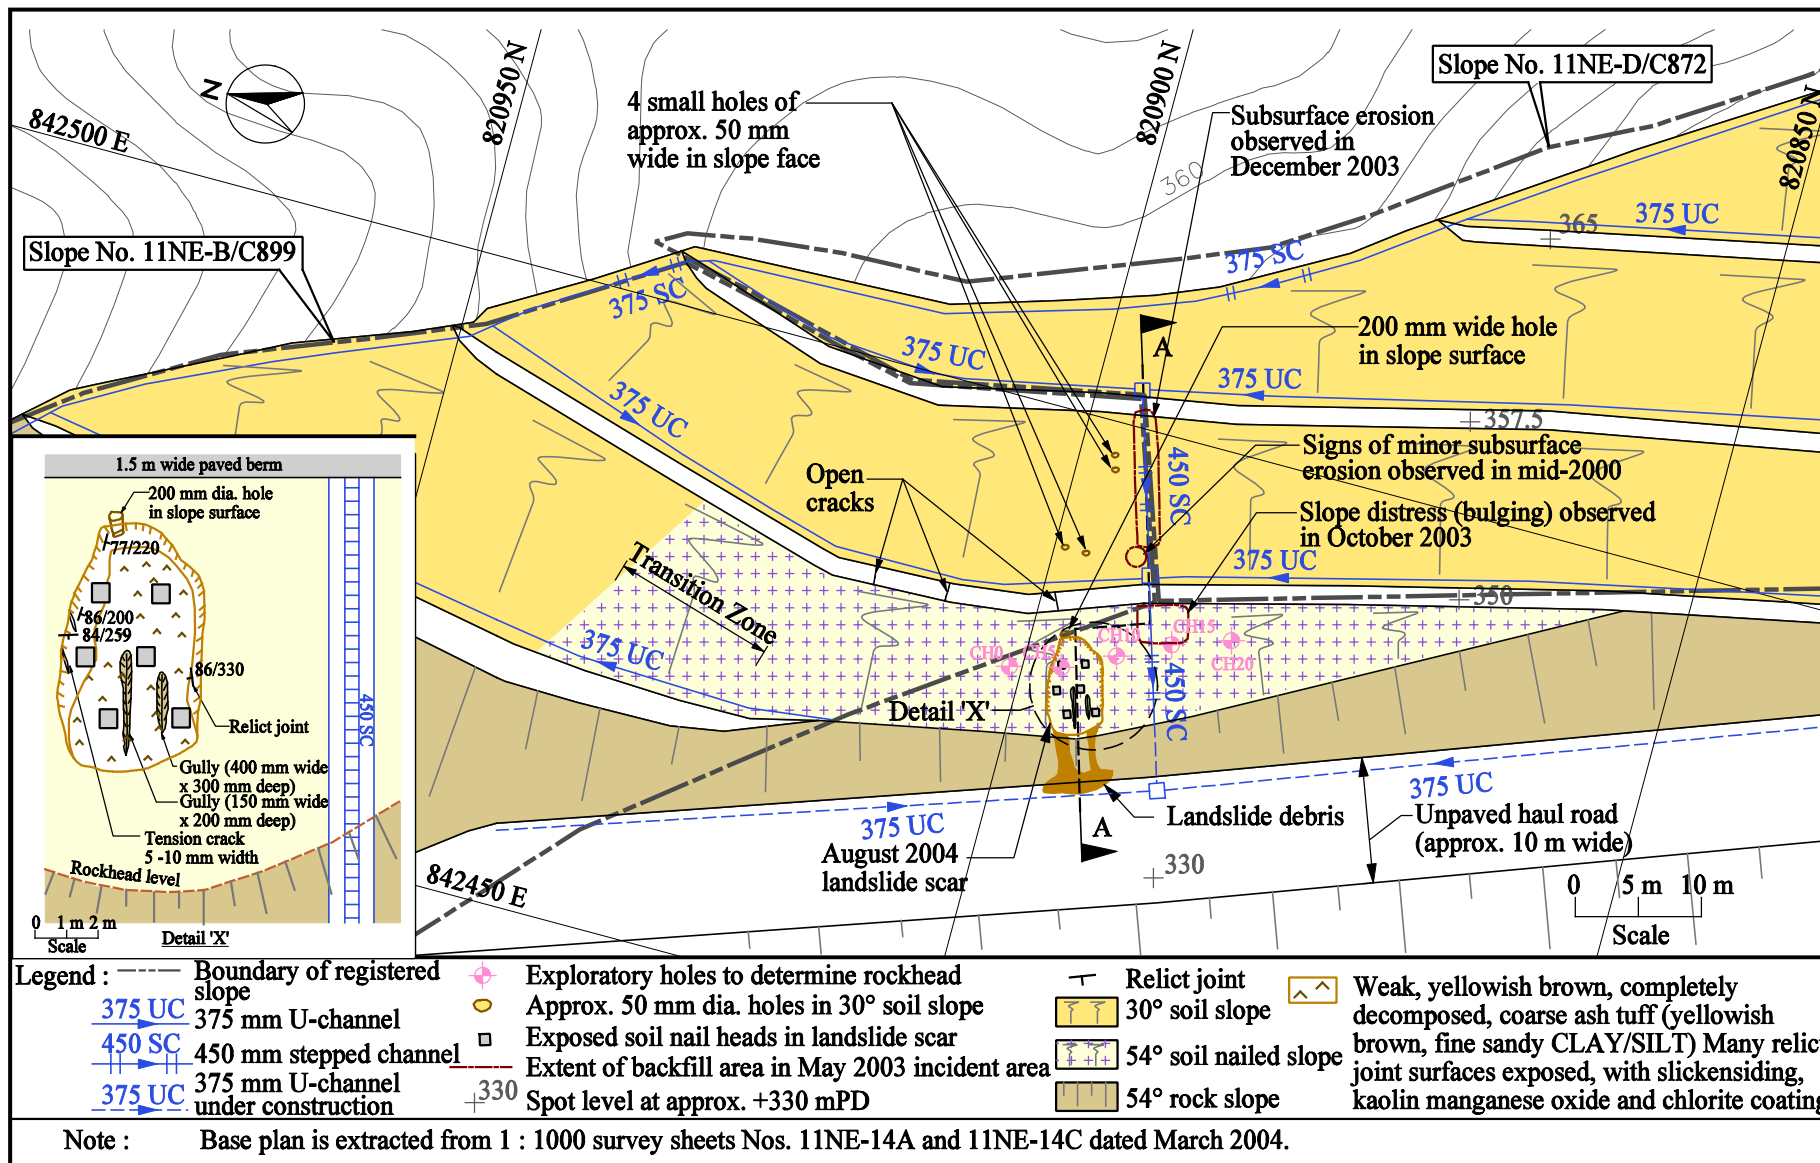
Site Plan of the August 2004 Landslide at Anderson Road
